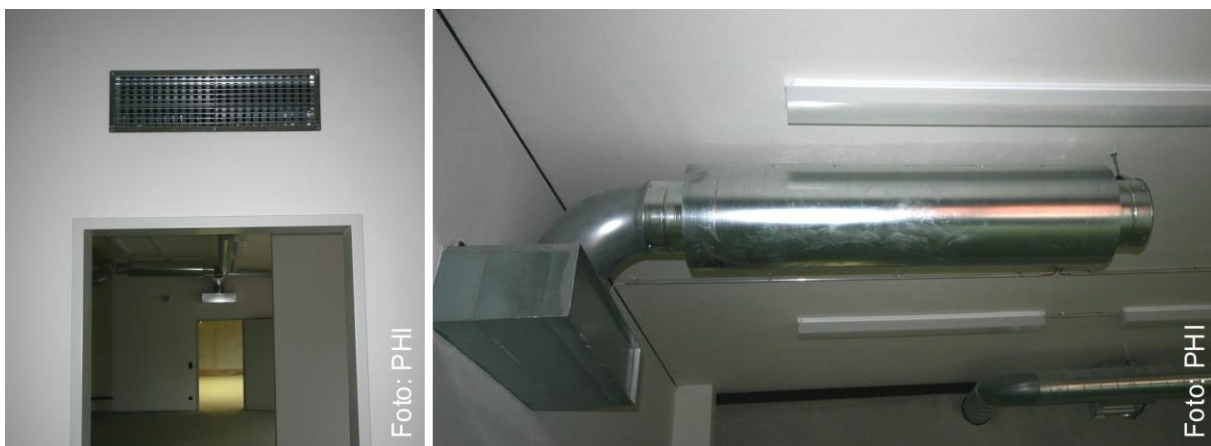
Air transfer from the subject room into the preparation room. The sound absorbing air transfer element was assembled using duct sections and built-in components for ducts. Schul-Pavillon Walldorf / Architecture: IB W. Herrmann, Walldorf / Building Services: Gadow + Graeske, Walldorf.
